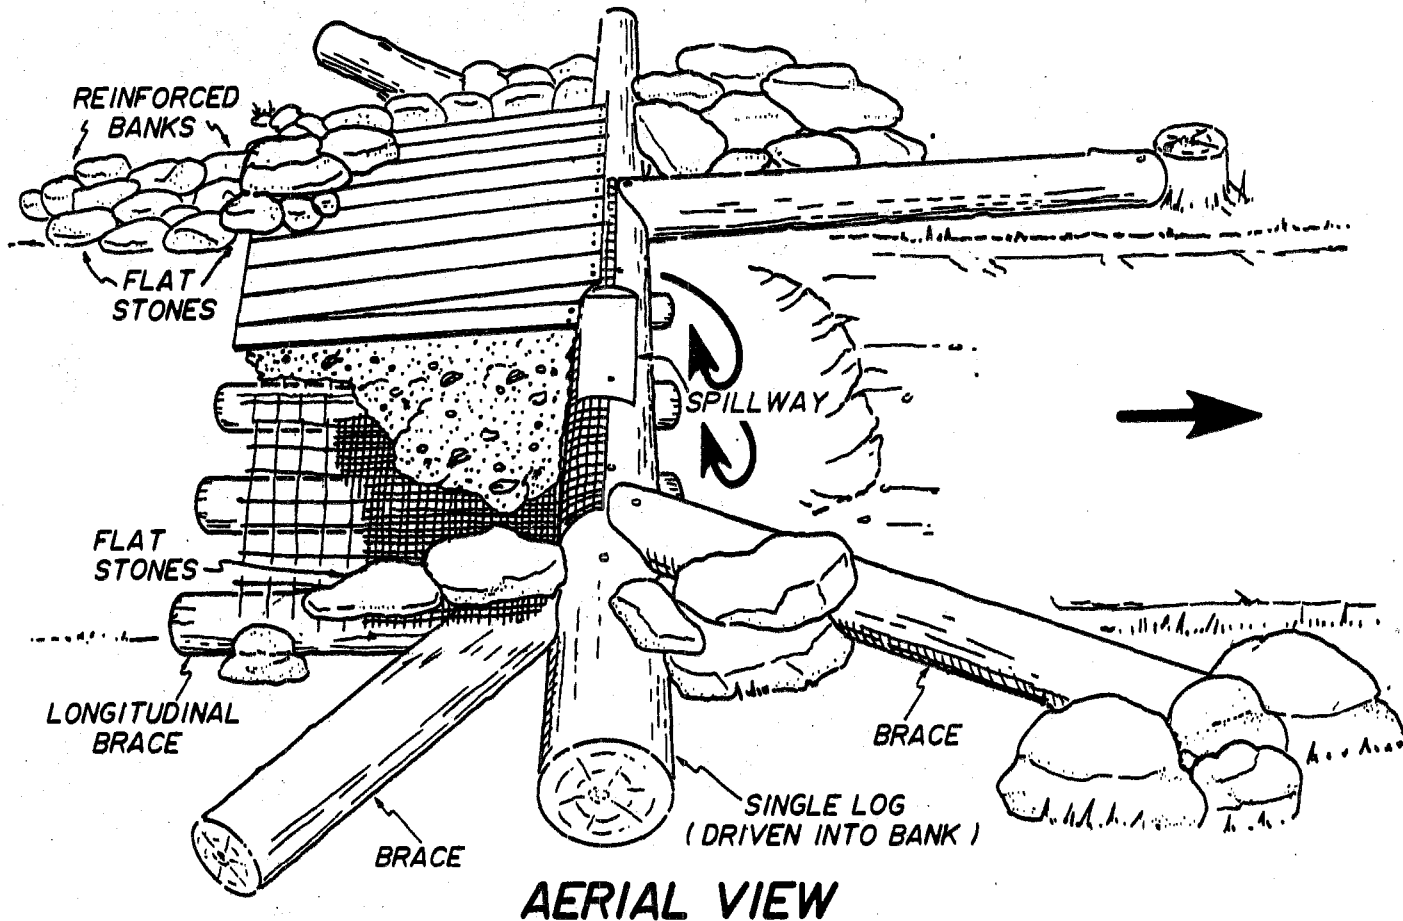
SINGLE LOG DAM WITH PLANK FLOOR.
